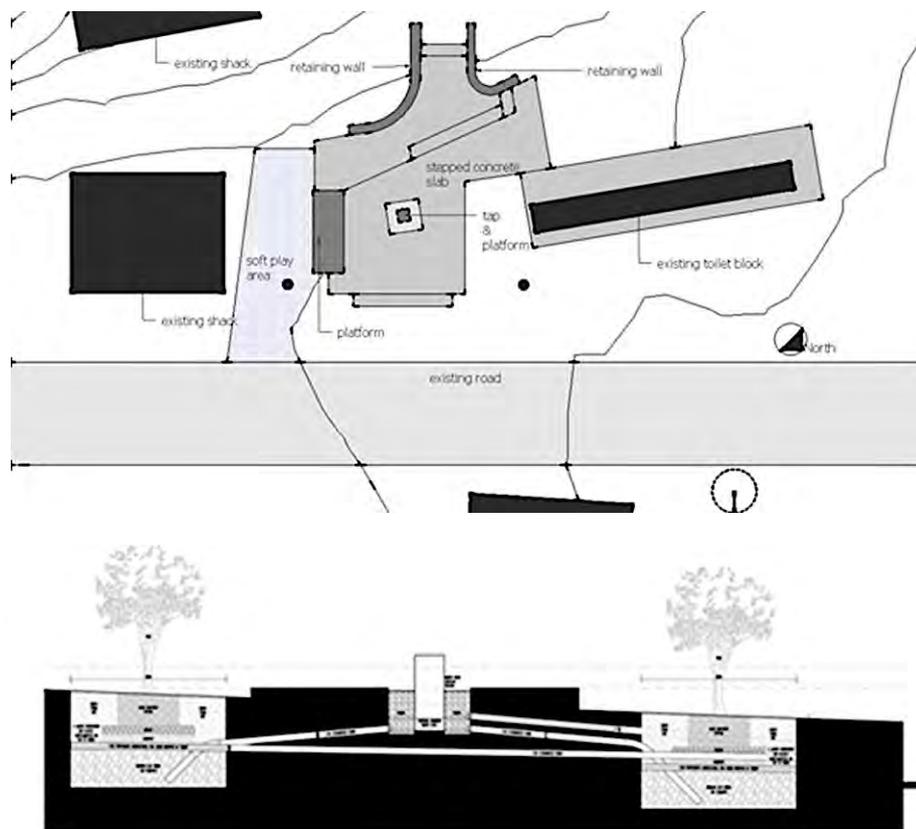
Sketches of the Small Public Space as Finally Designed (Plan and Section).
